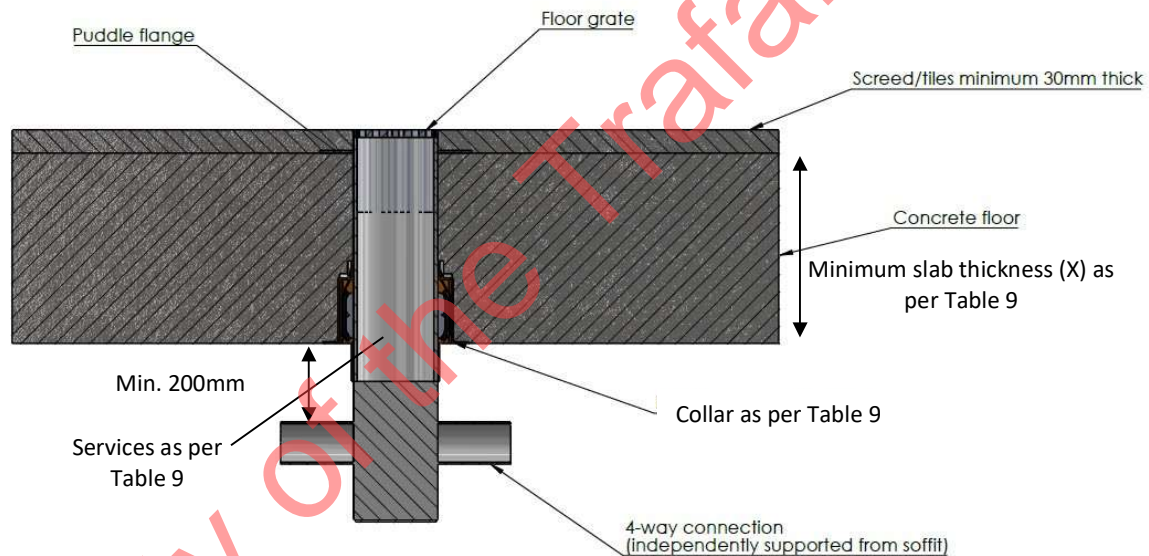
FW Cast-in collar with Floor waste pipes – 4-way gully
